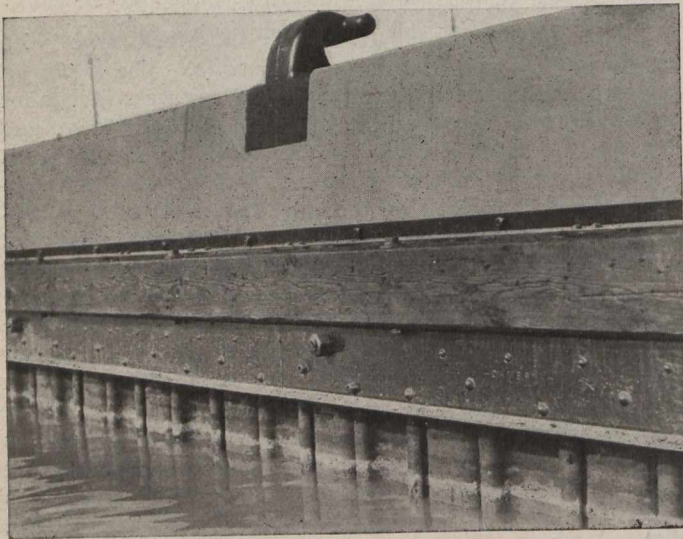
Piling Under North Wall of Don River Diversion, Toronto.
